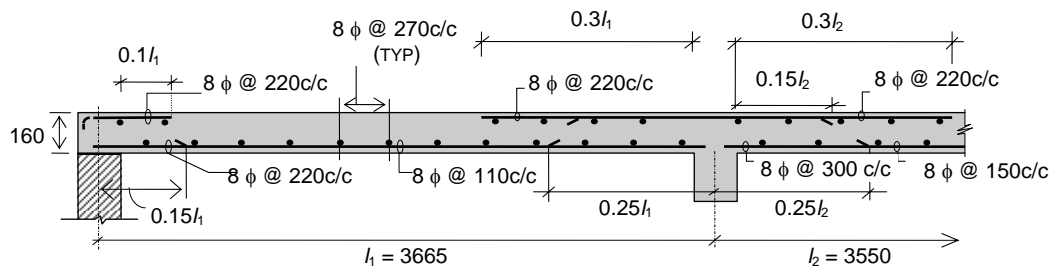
Details of one-way continuous slab — Example 5.3
